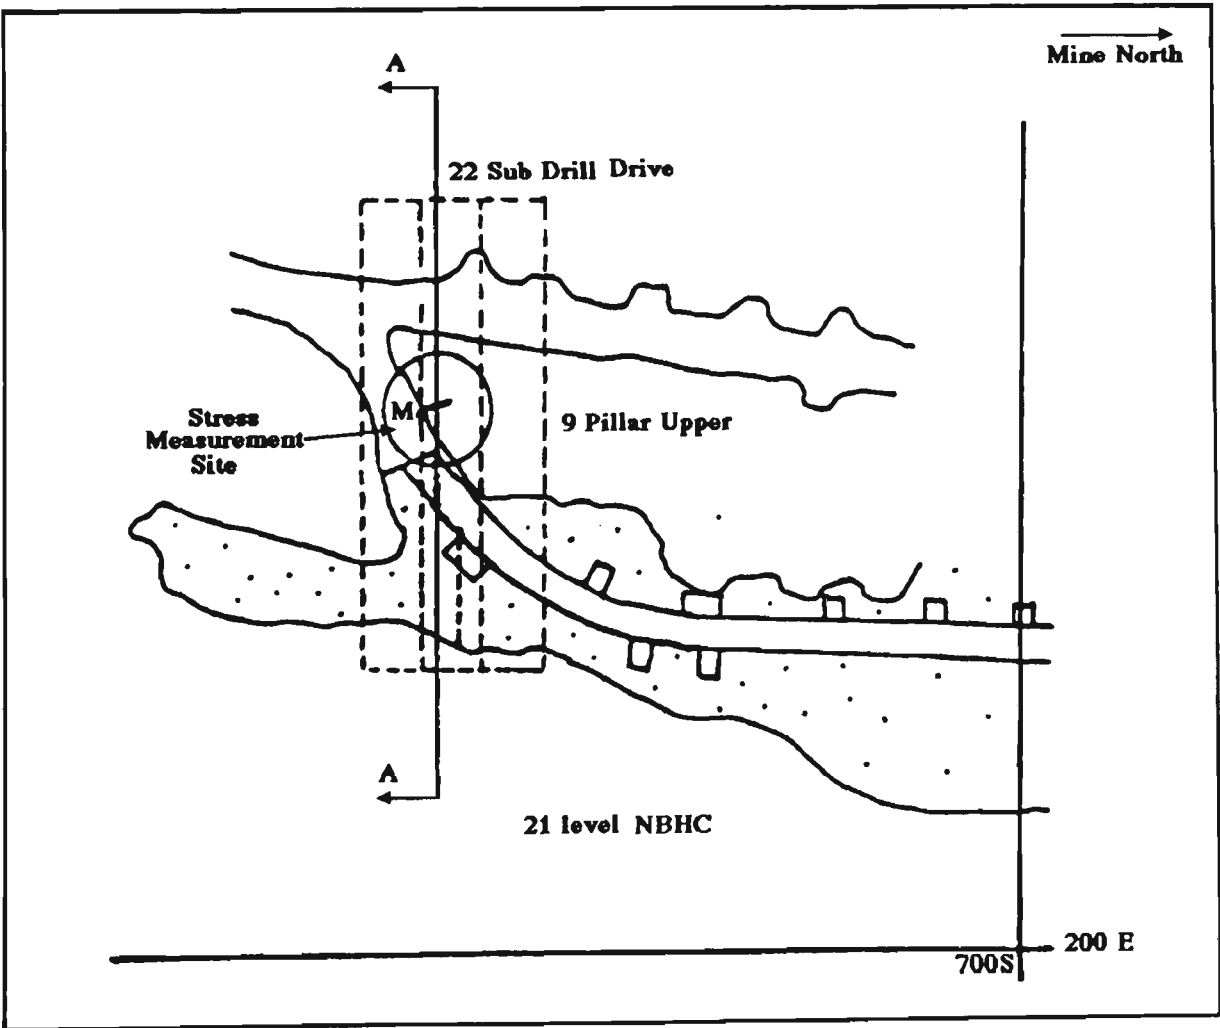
Plan view of the stress measurement site in 9 pillar upper stope
